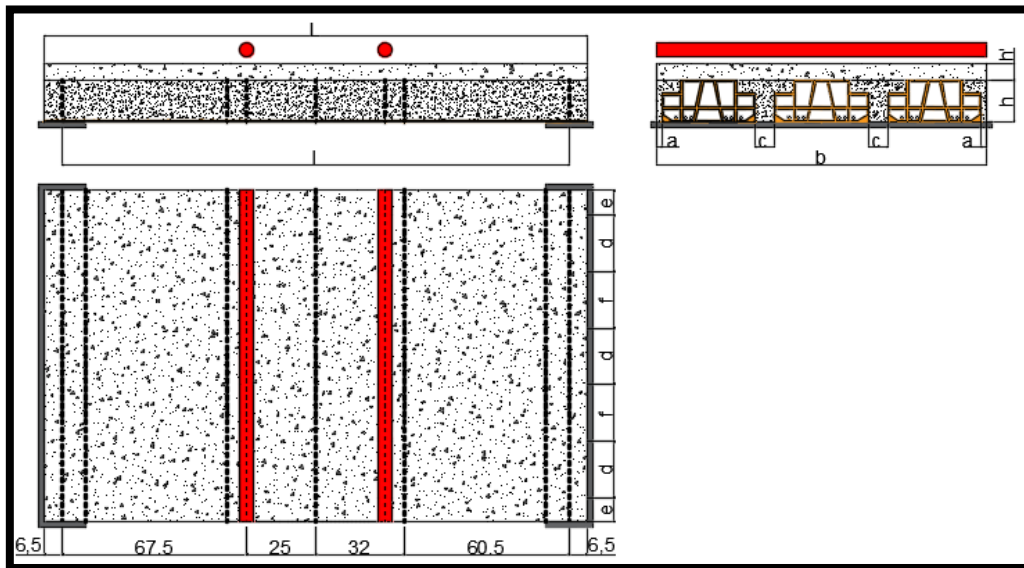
Design of the dimensions of the consolidated floor slab. (Source: Own design)
